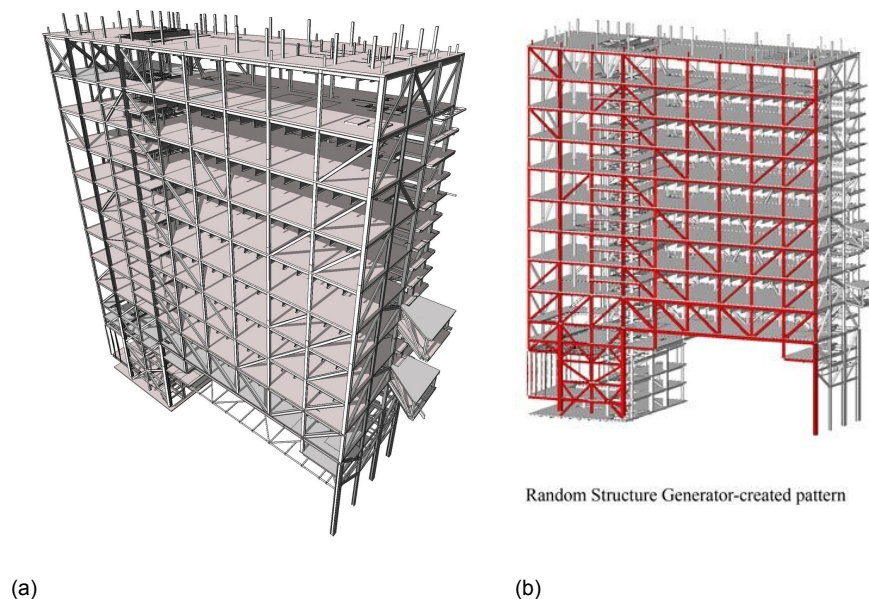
Columbia University Northwest Corner Building structure and Random Structure Generator pattern
